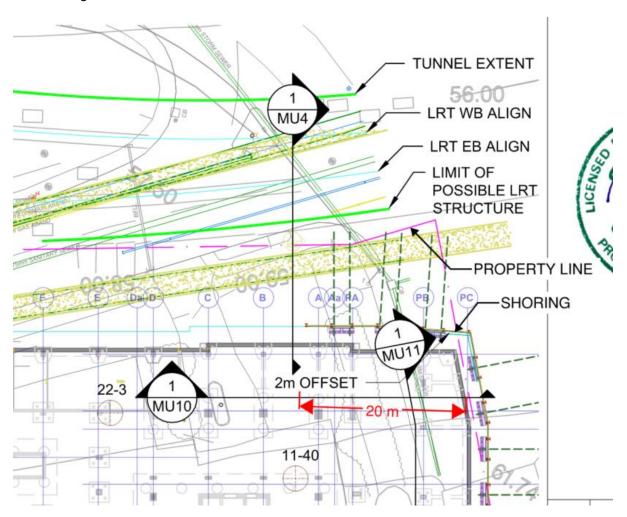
Extract from proposed Support of Excavation plans showing wall location at north-east of site
